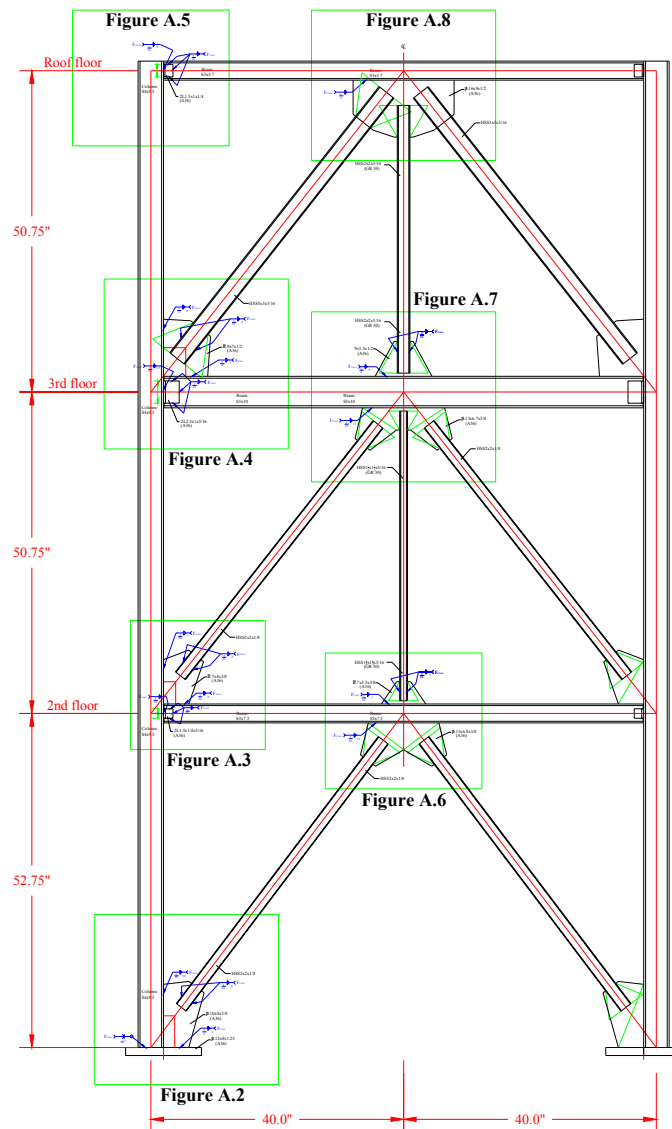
Elevation view of the 1/3-scale zipper-braced frame.
